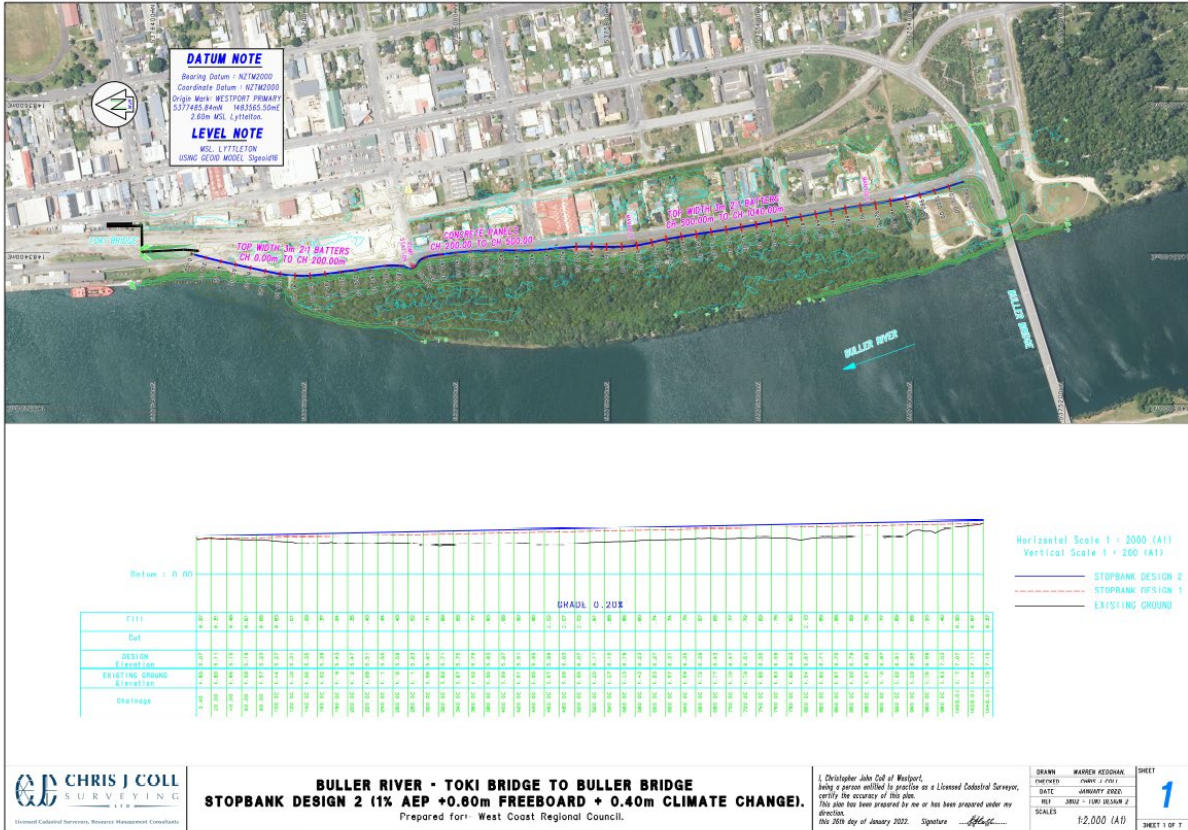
Toki Bridge Stopbank plan view and longitudinal survey
